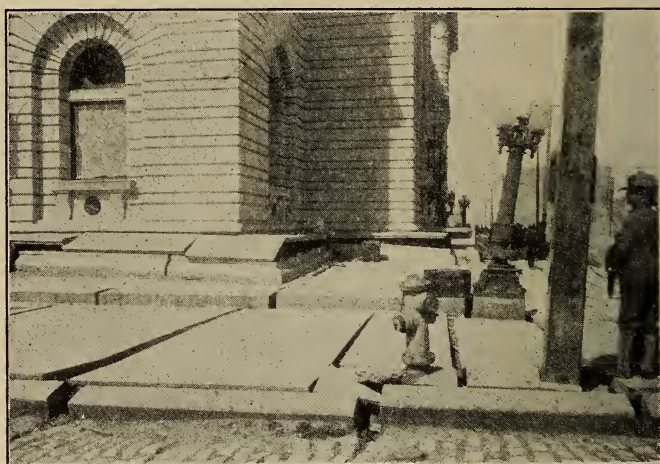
General Postoffice, Southwest Corner, Showing Severe Distortion and Subsidence of the Sidewalk and Street Levels.
